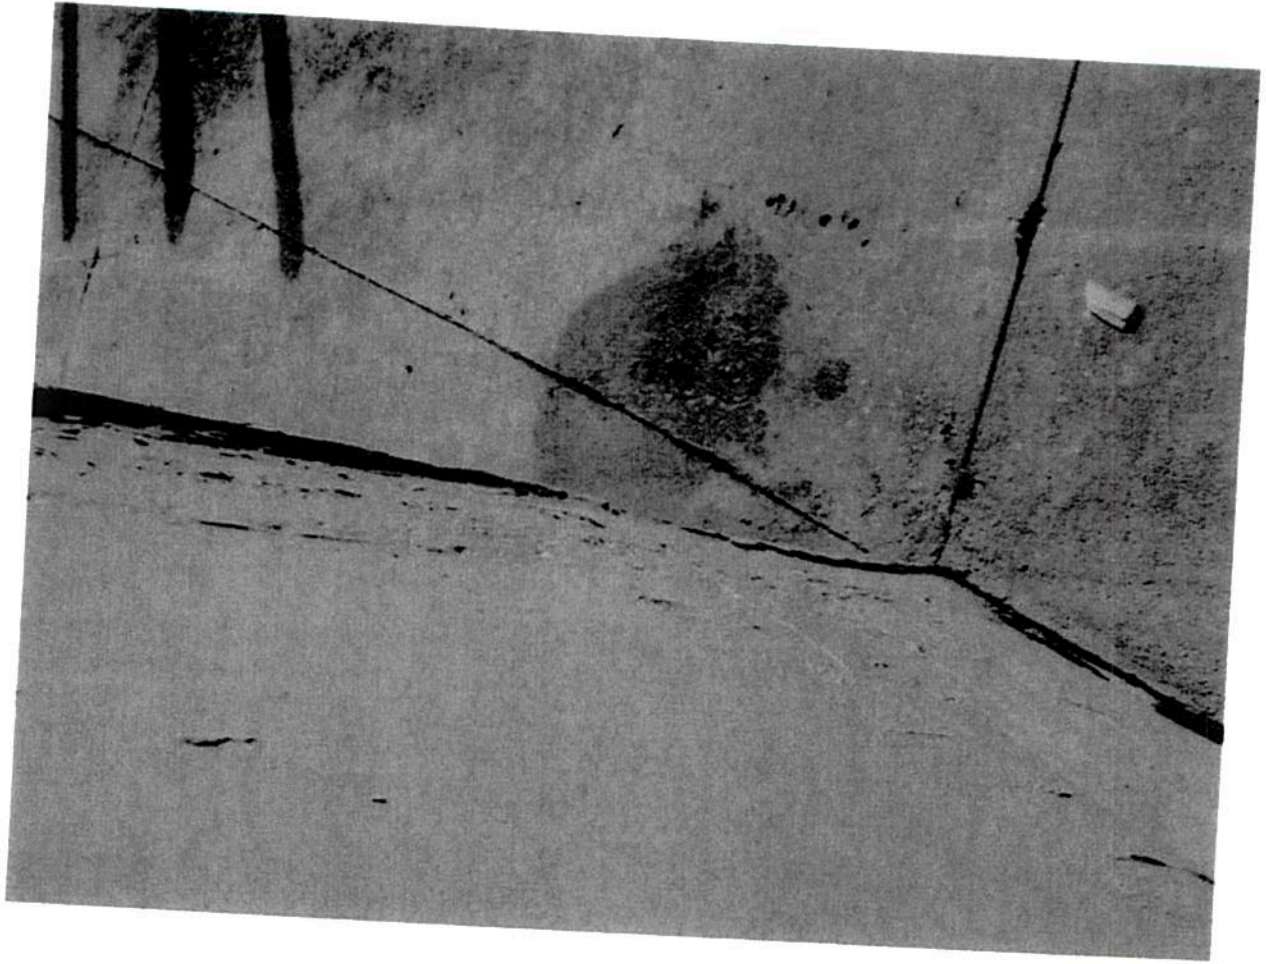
Cracks observed in the south containment wall of the Drum Processing Area
